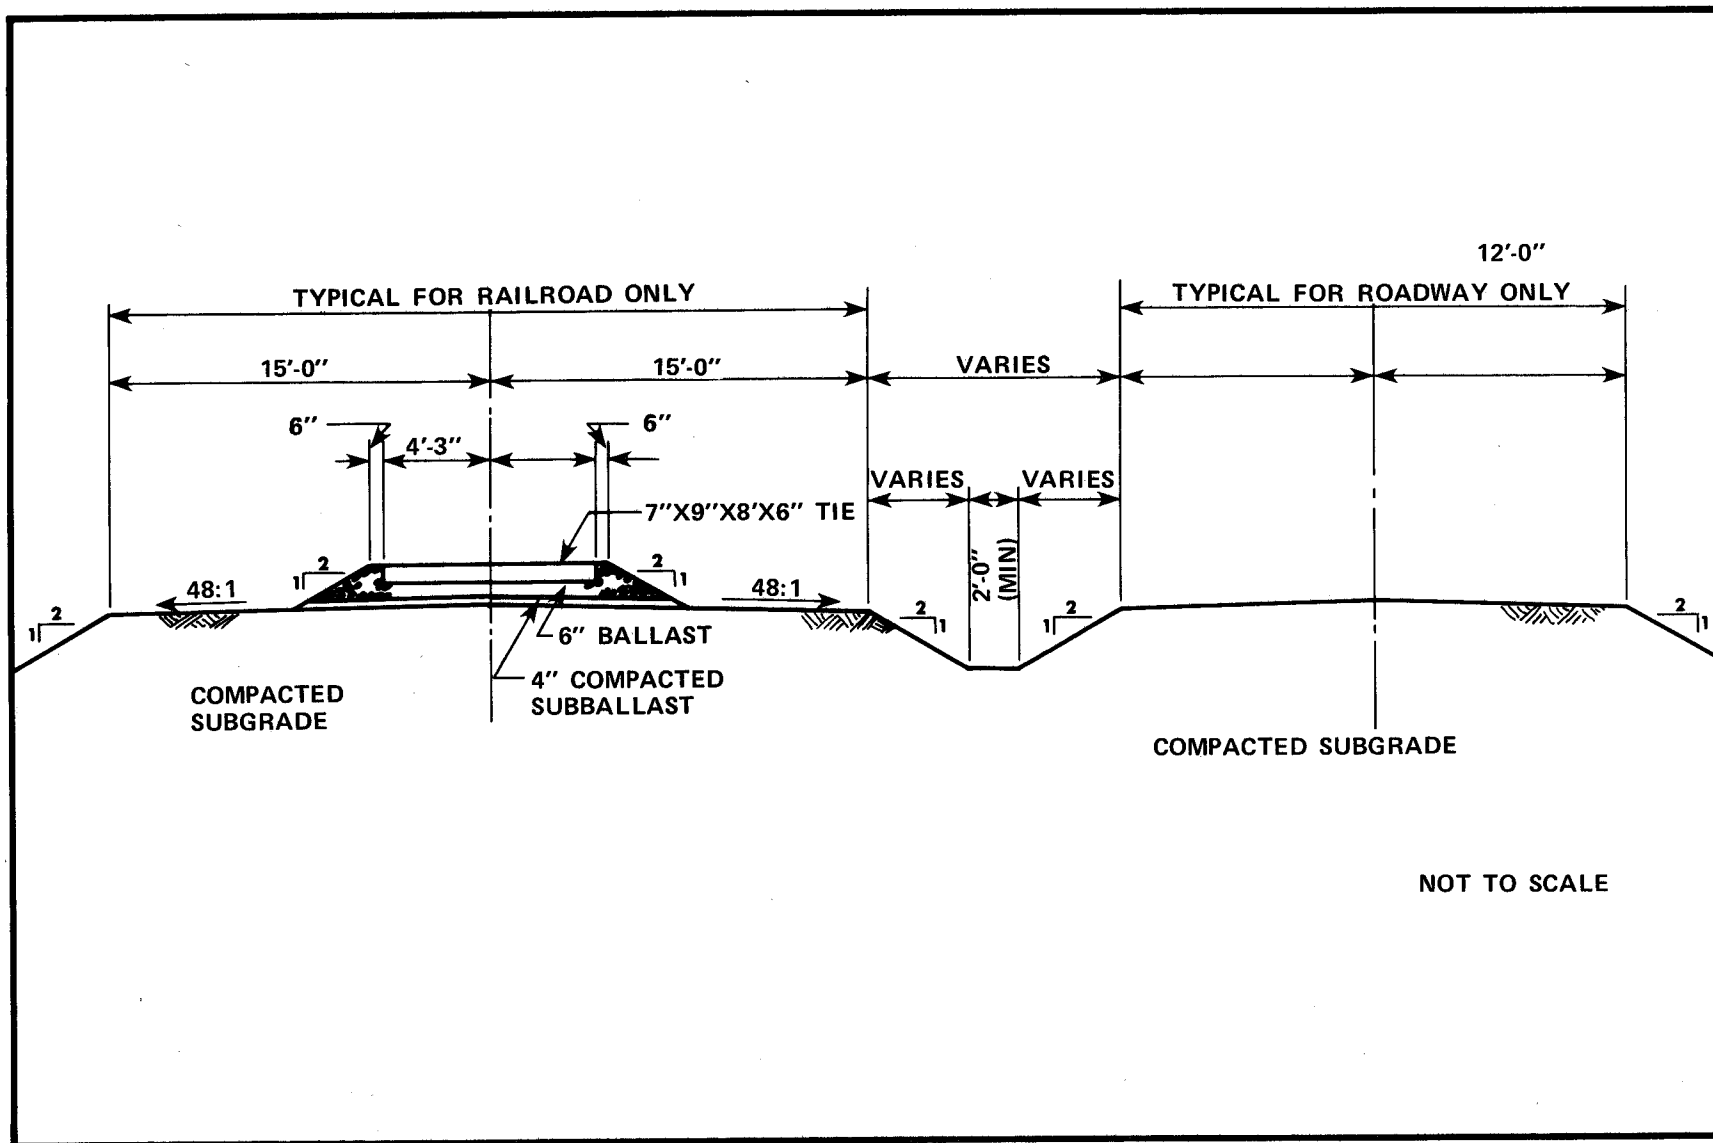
TYPICAL SECTION FOR SINGLE TRACK RAILROAD AND ROADWAY.
